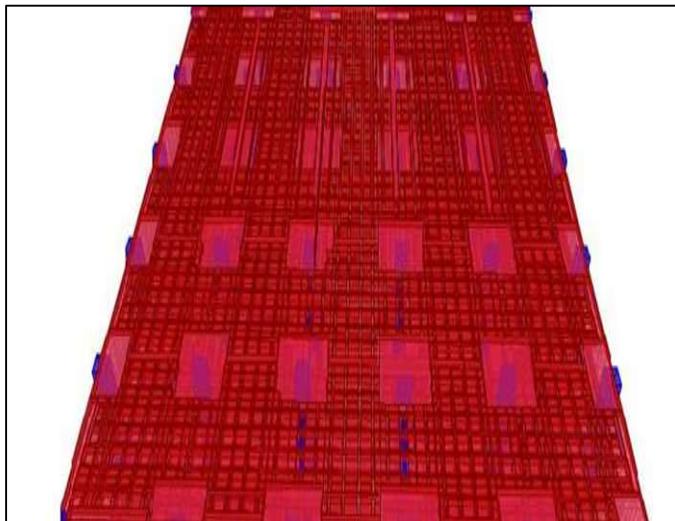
Betoning Position view of Finite Element Model (SAP-2000 Window)
